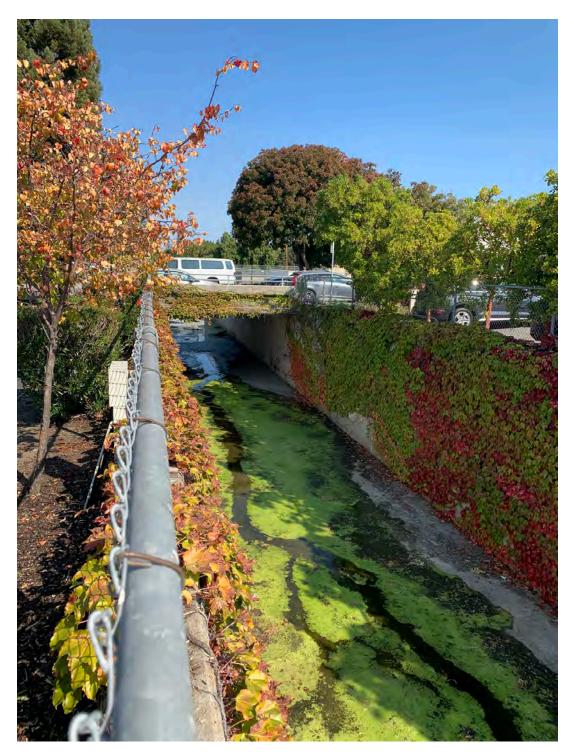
Existing Channel View Downstream with Park Boulevard Bridge
